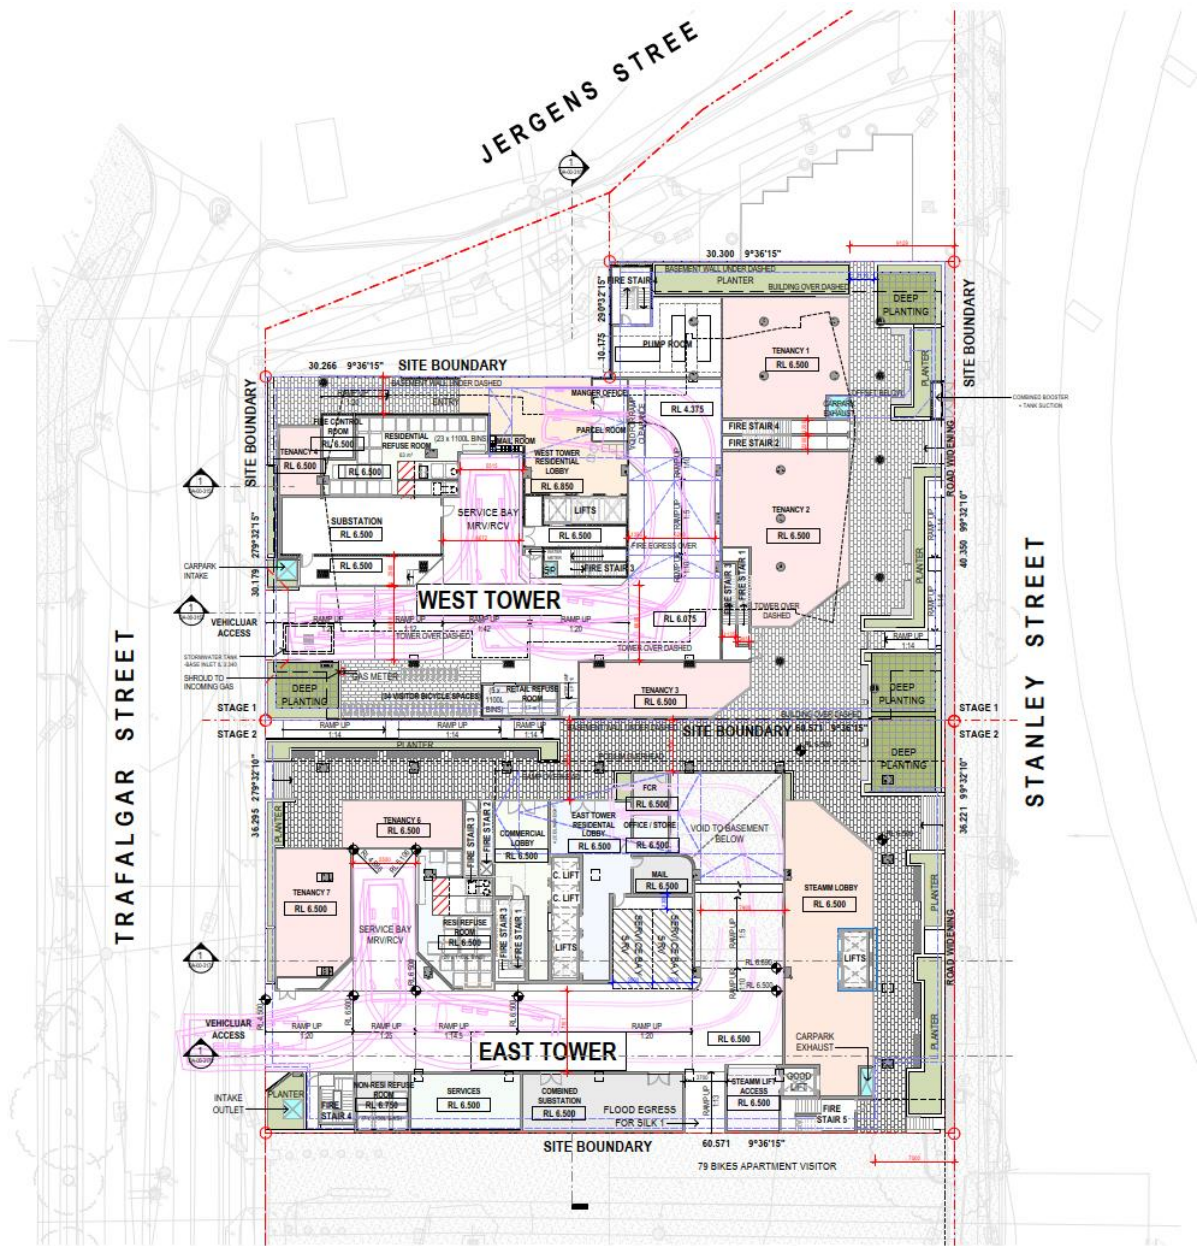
Level 1 (Ground Entry) Floor Plan (Source: GSA, 2025)
